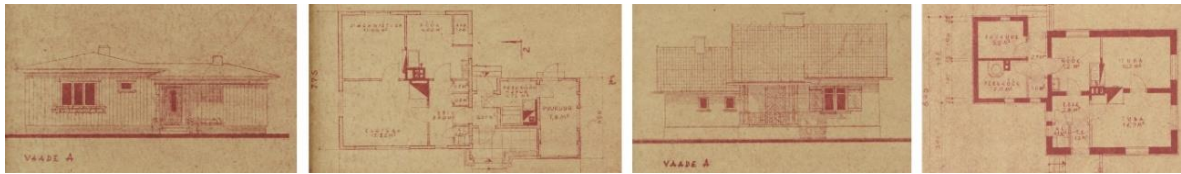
Examples of bungalow dwellings from 1954 with auxiliary wings (left to right: project 8 with elevation and ground floor; project 7 with elevation and ground floor) (VPI Estonprojekt, 1954)
